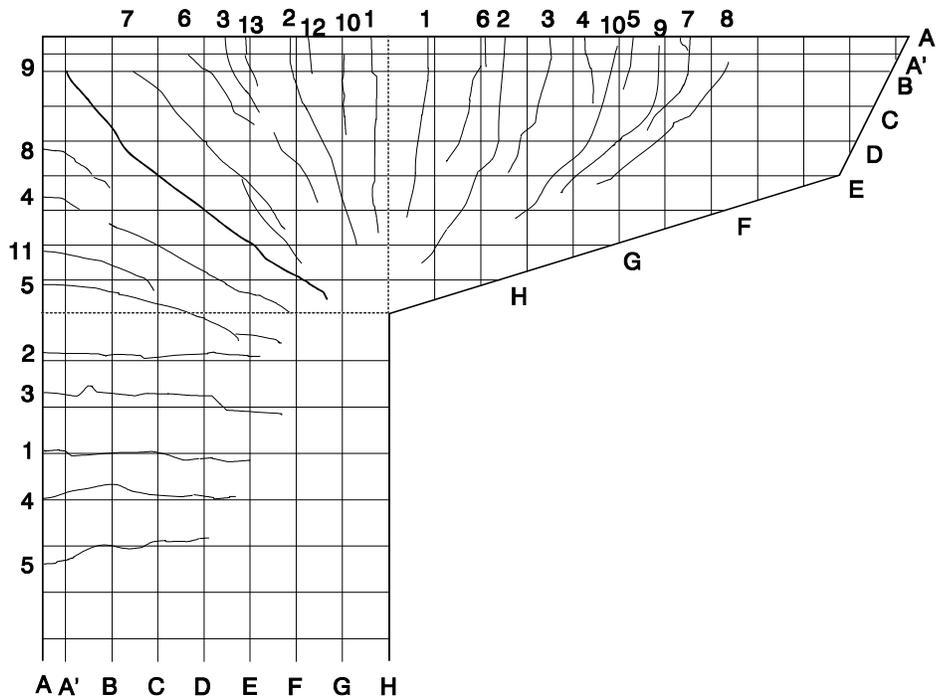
POJ-RC-100-TH cracking pattern on north face of specimen at failure
